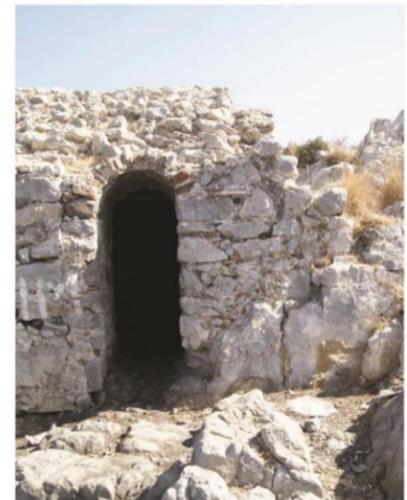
East Elevation -Construction Technique and Material Usage
